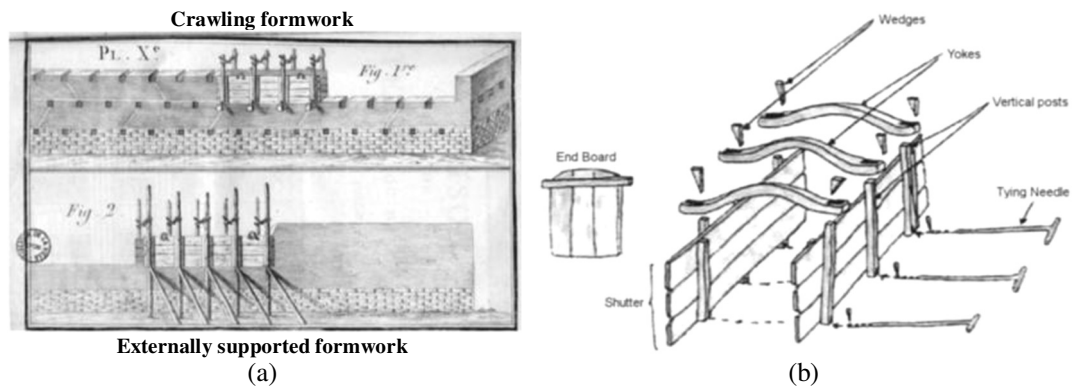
Rammed earth formworks: (a) Crawling and externally supported formwork (Cointeraux 1791); elements of a traditional crawling formwork (Cabral 2006).
